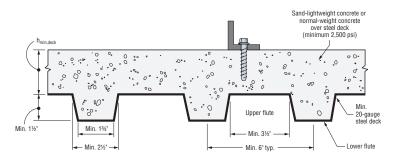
Installation of 1/4"- and %"-Diameter Anchors in the Topside of Concrete over Steel Deck
